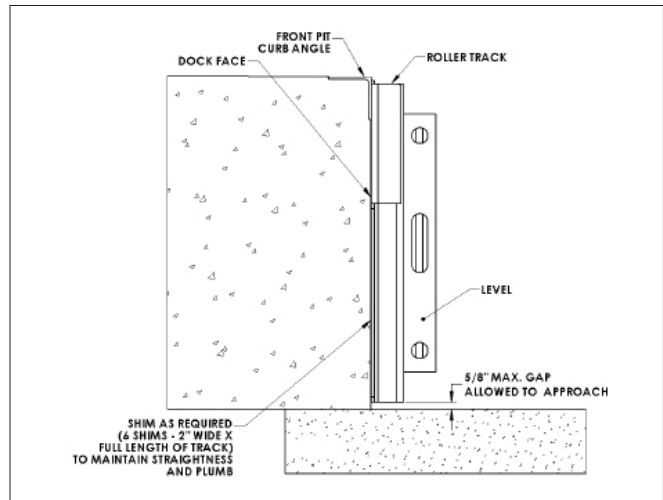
FIGURE D—WELDING ROLLER TRACK SIDE VIEW
